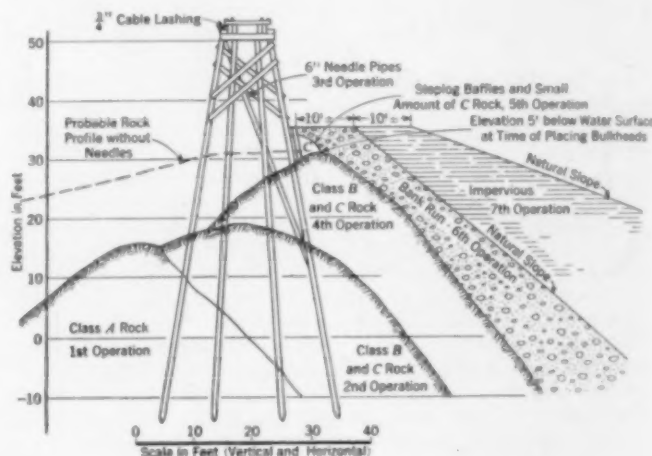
TYPICAL CROSS-SECTION OF ROCK CUTOFF
